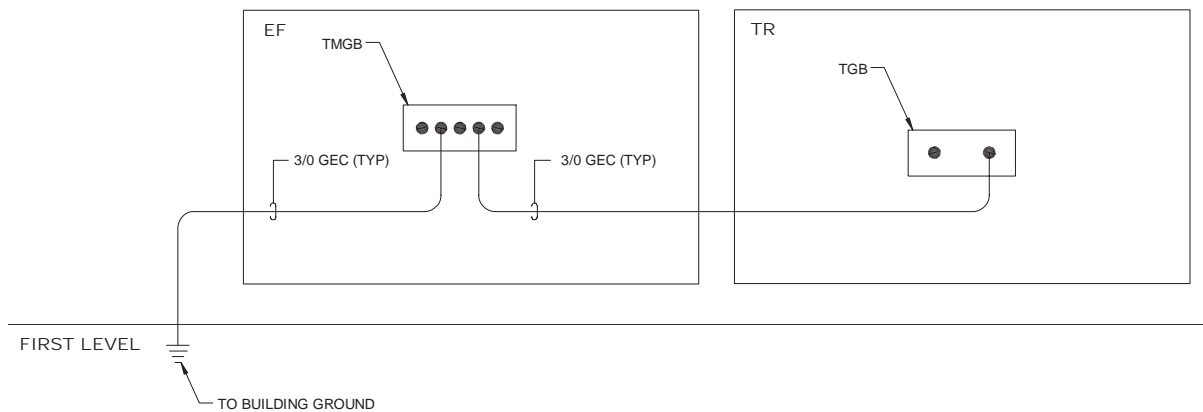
Typical Ground/Bonding Riser Diagram
